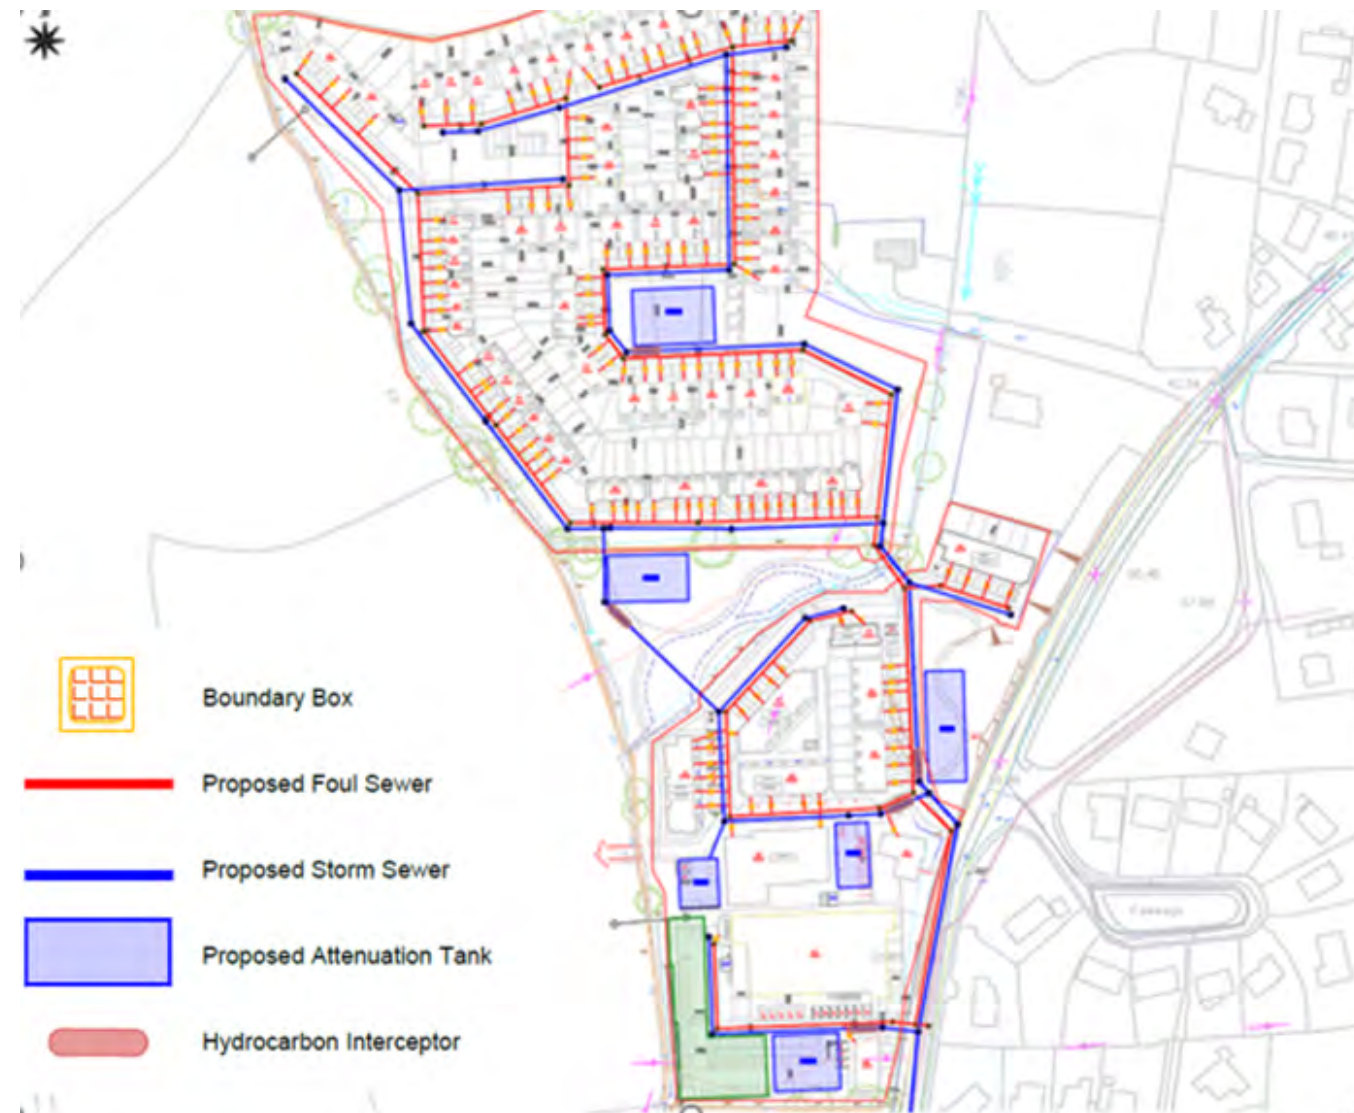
Proposed Drainage/Flood Storage Strategy - MHL & Associates Consulting Engineers
